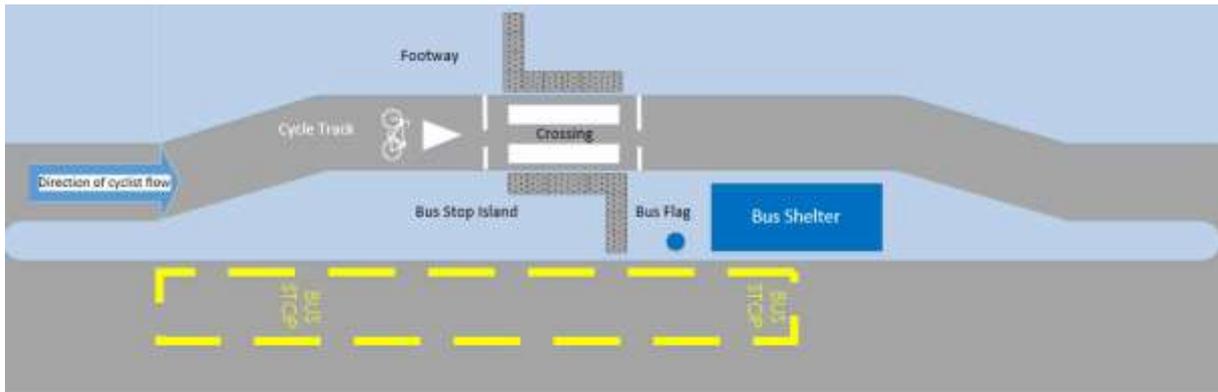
Bus Stop Bypass layout with 1-way cycle track and zebra crossing
